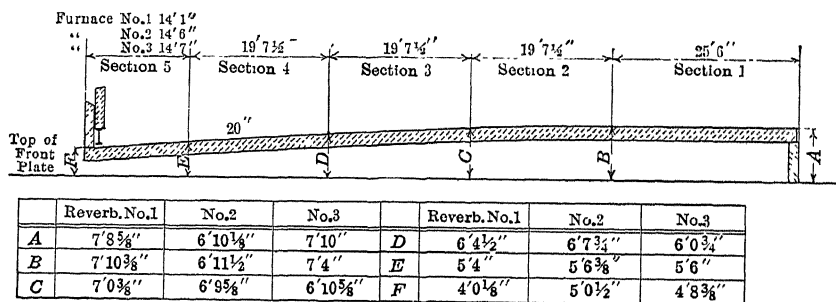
SKETCH SHOWING POSITION OF REVERBERATORY ARCHES ON CENTER LINE.
